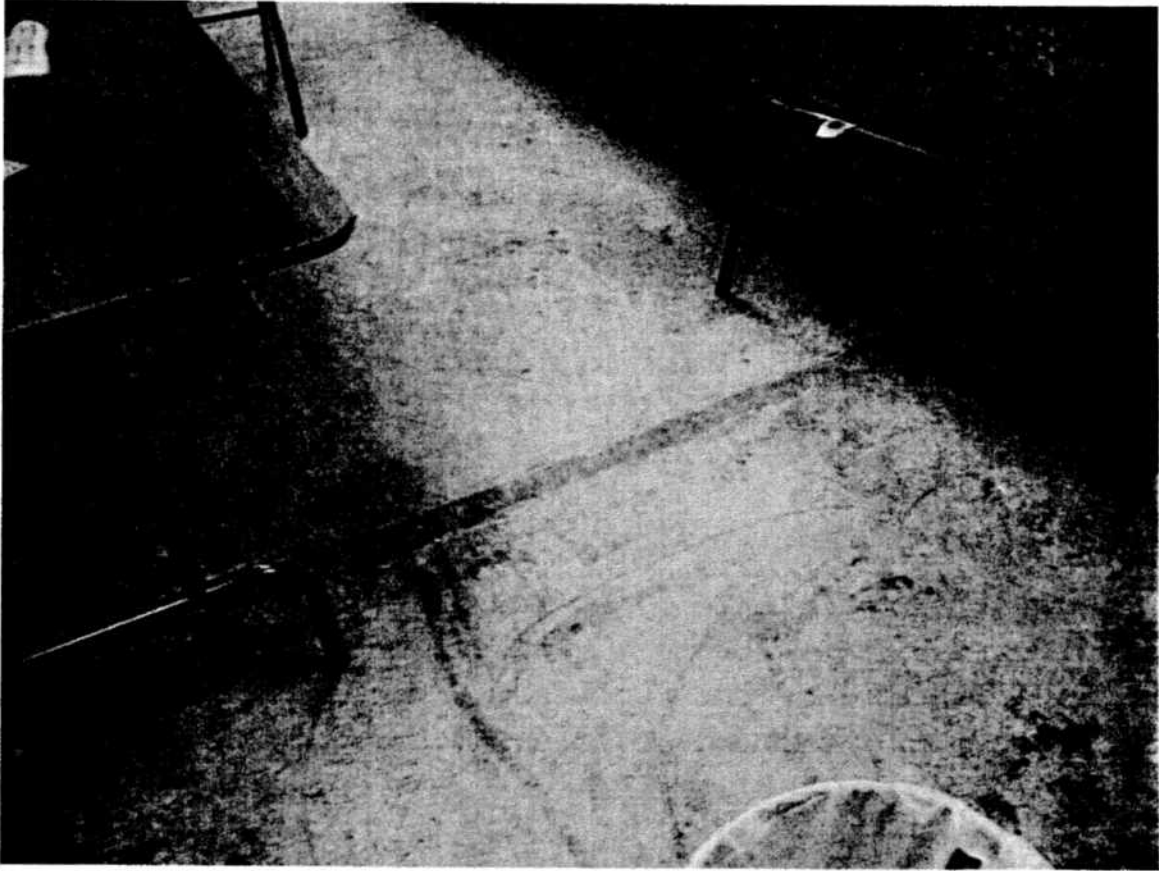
Healdton Armory: Healdton Fire Department meeting room in west side of the building. Carpeting used by the National Guard was removed. This picture shows the carpet glue left behind.
